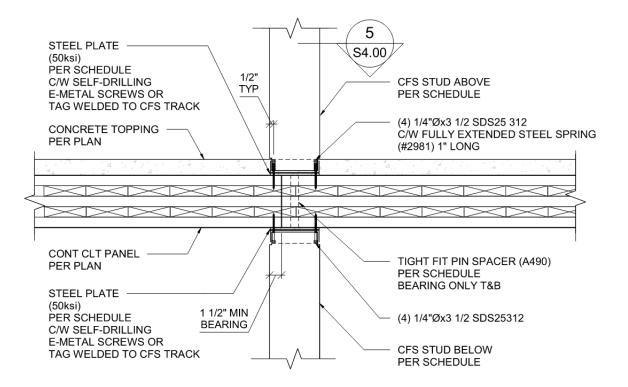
Novel Connection detail for CLT/CFS System at panel joint
